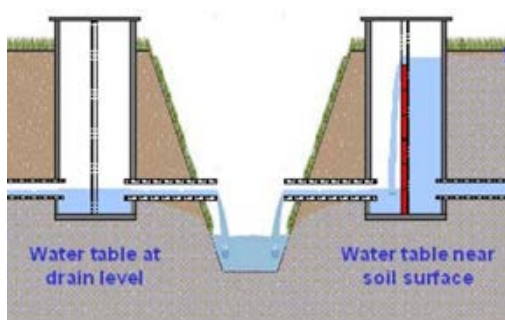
Irrigation Drainage Tile Layout, IDT Control Box, Field Installation
